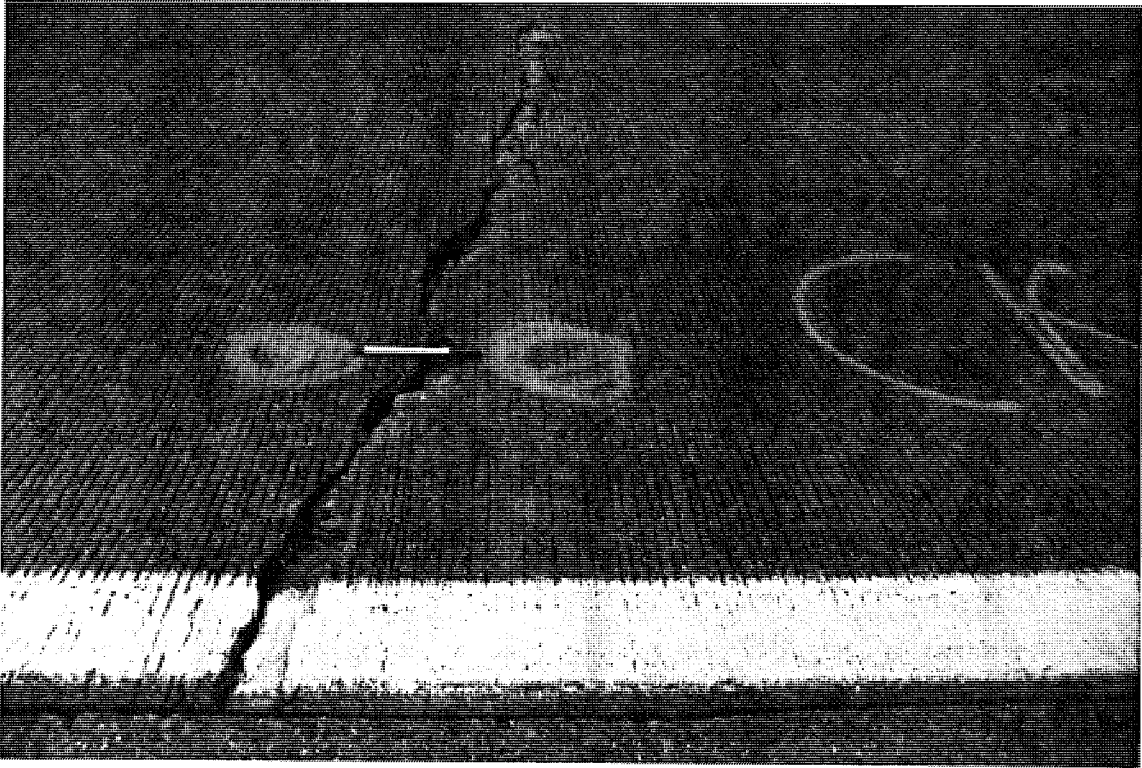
A typical transverse crack on CSN# 77024-20821A (Section A), EB, showing severe spalling and faulting.
